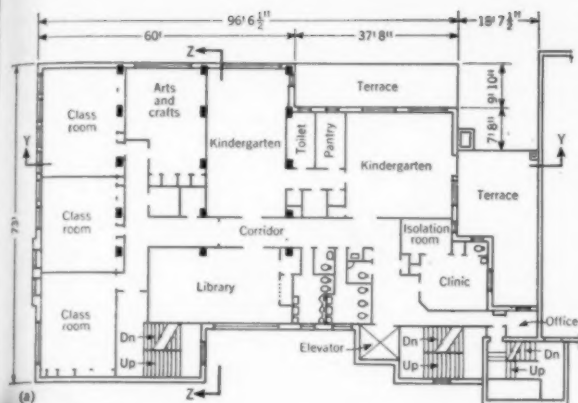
(a and b). Floor plan of third floor (a) shows location of corridors and classrooms that dictated use of
